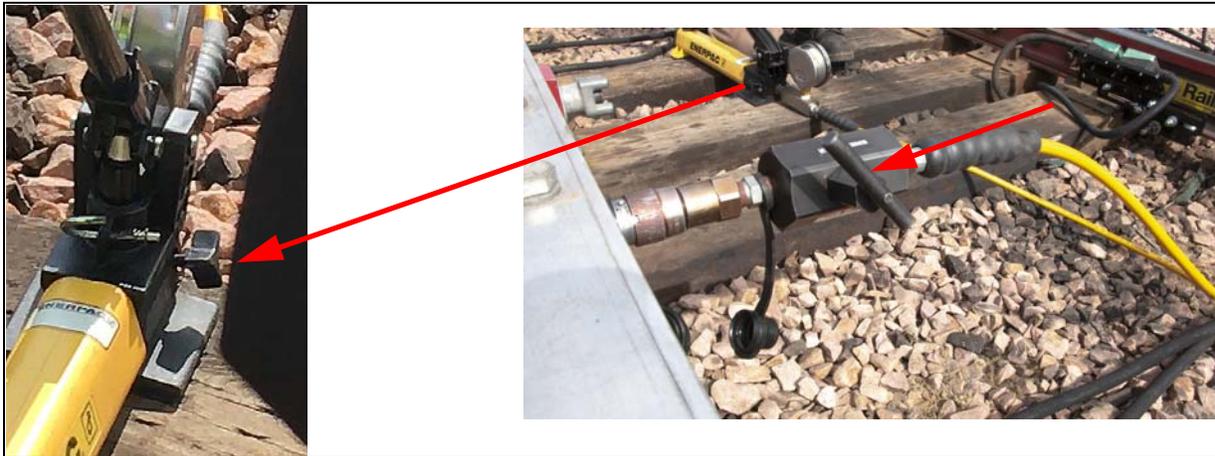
Relief Valve Locations on the Hydraulic Pump and Calibrator
